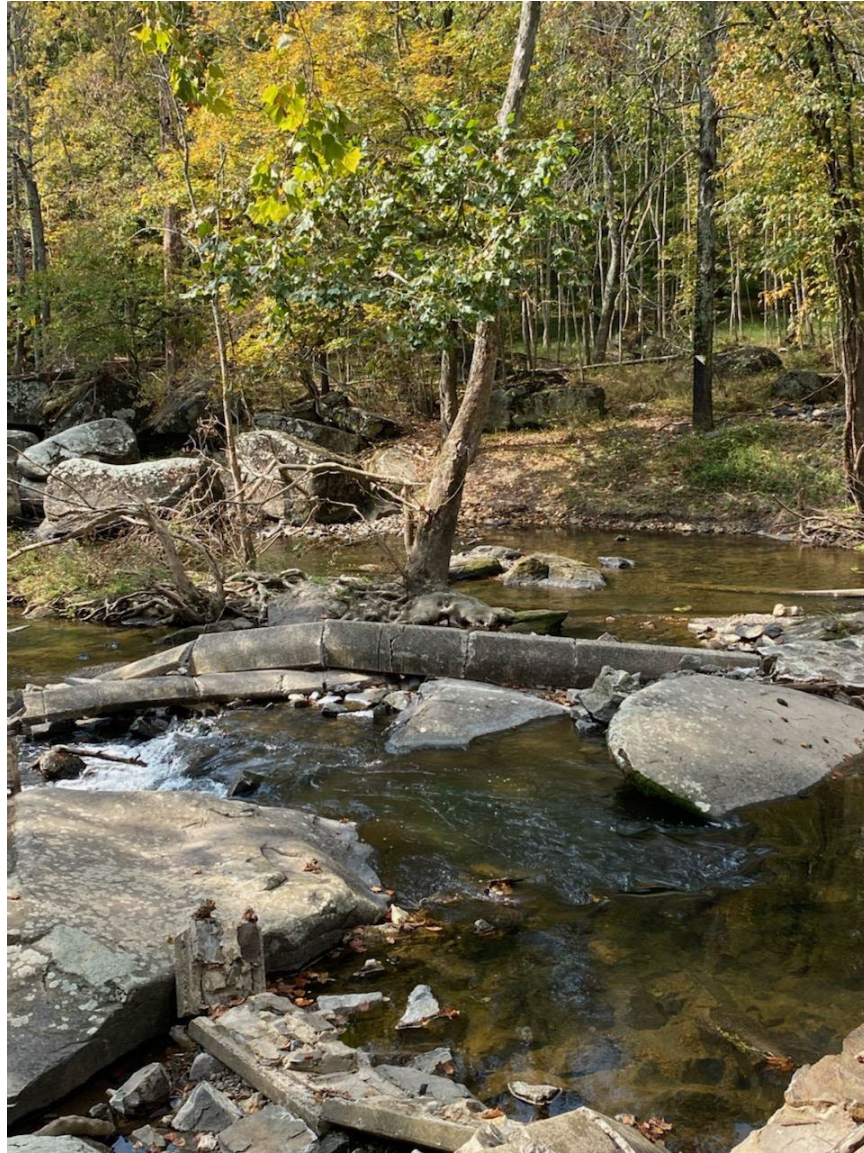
Price Rd Bridge View of Section of Bridge Wall Carried Downstream (40.357866, -75.426465).
